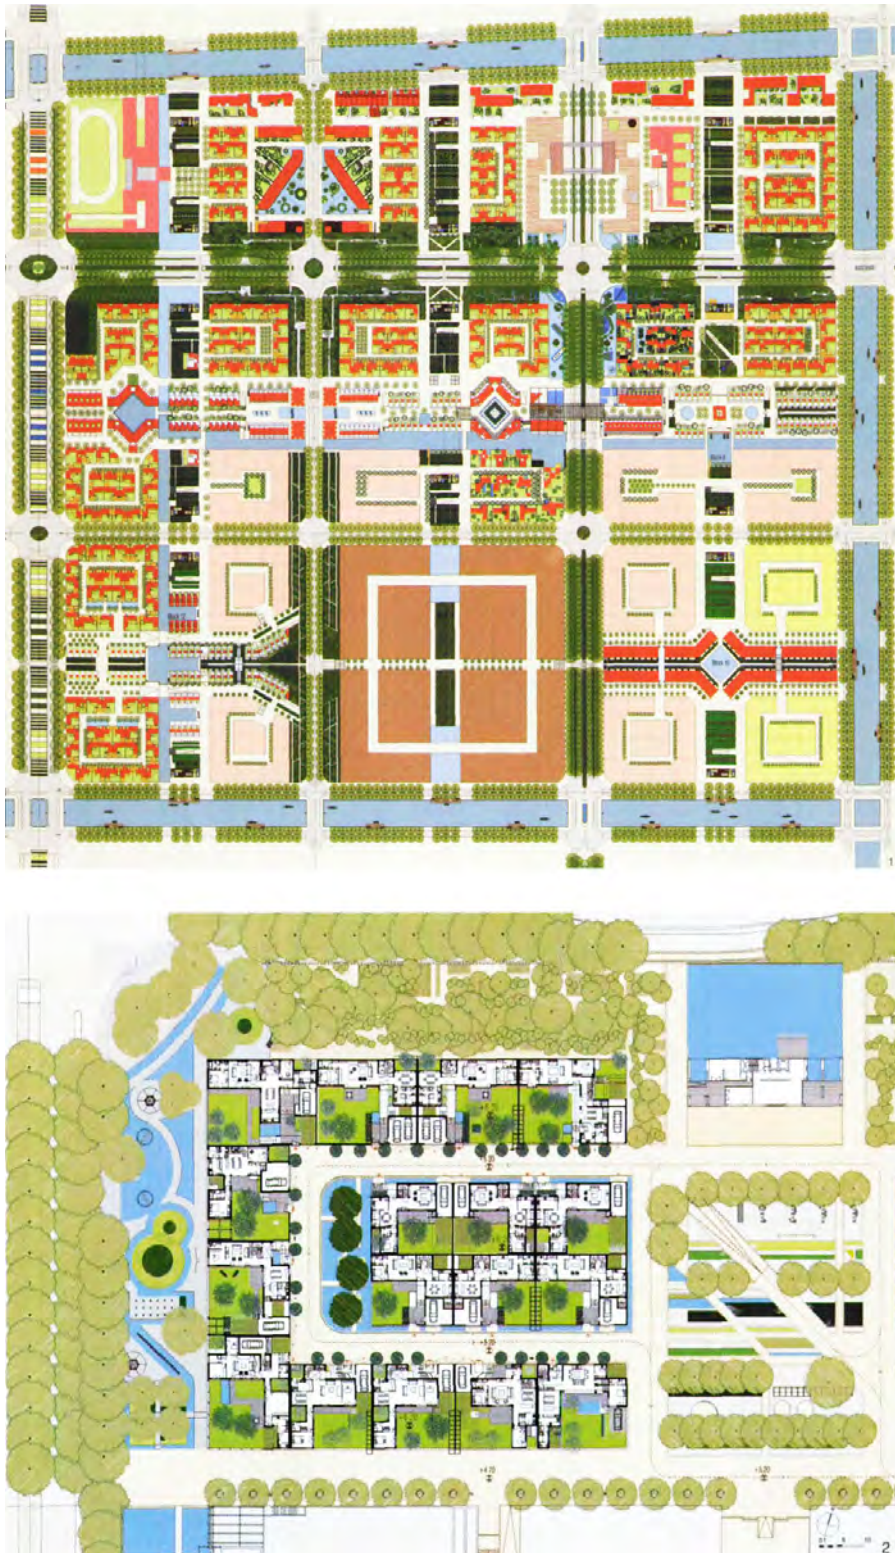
The Planning of Pujiang New Town. Phase I, The Master Plan (top) and site plan of “Road Villa” Area (bottom). From Huang Xiangming, “Building an Ideal City: Interpretation on the Planning and Architectural Practice of the New Pujiang City Project,” *Time+Architecture* 02 (2009): 44-9.
